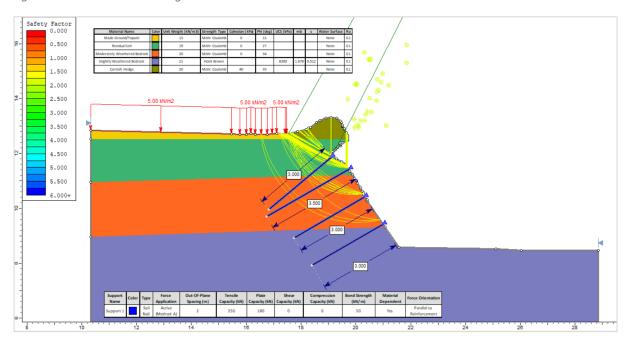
Section 2 – Soil Nailing - BS8006 Set2
